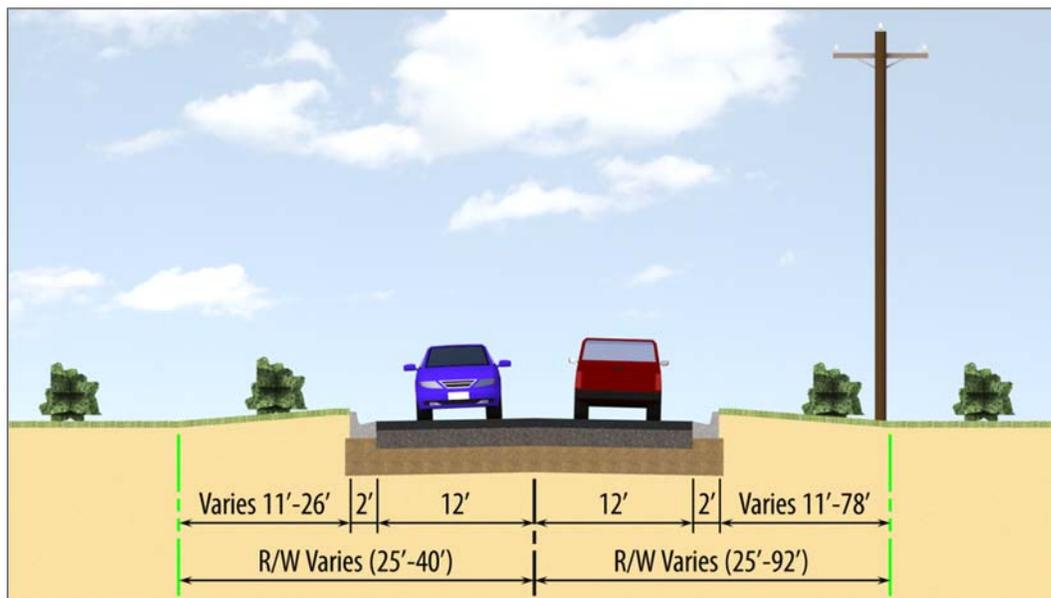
EXISTING ROADWAY TYPICAL SECTION
